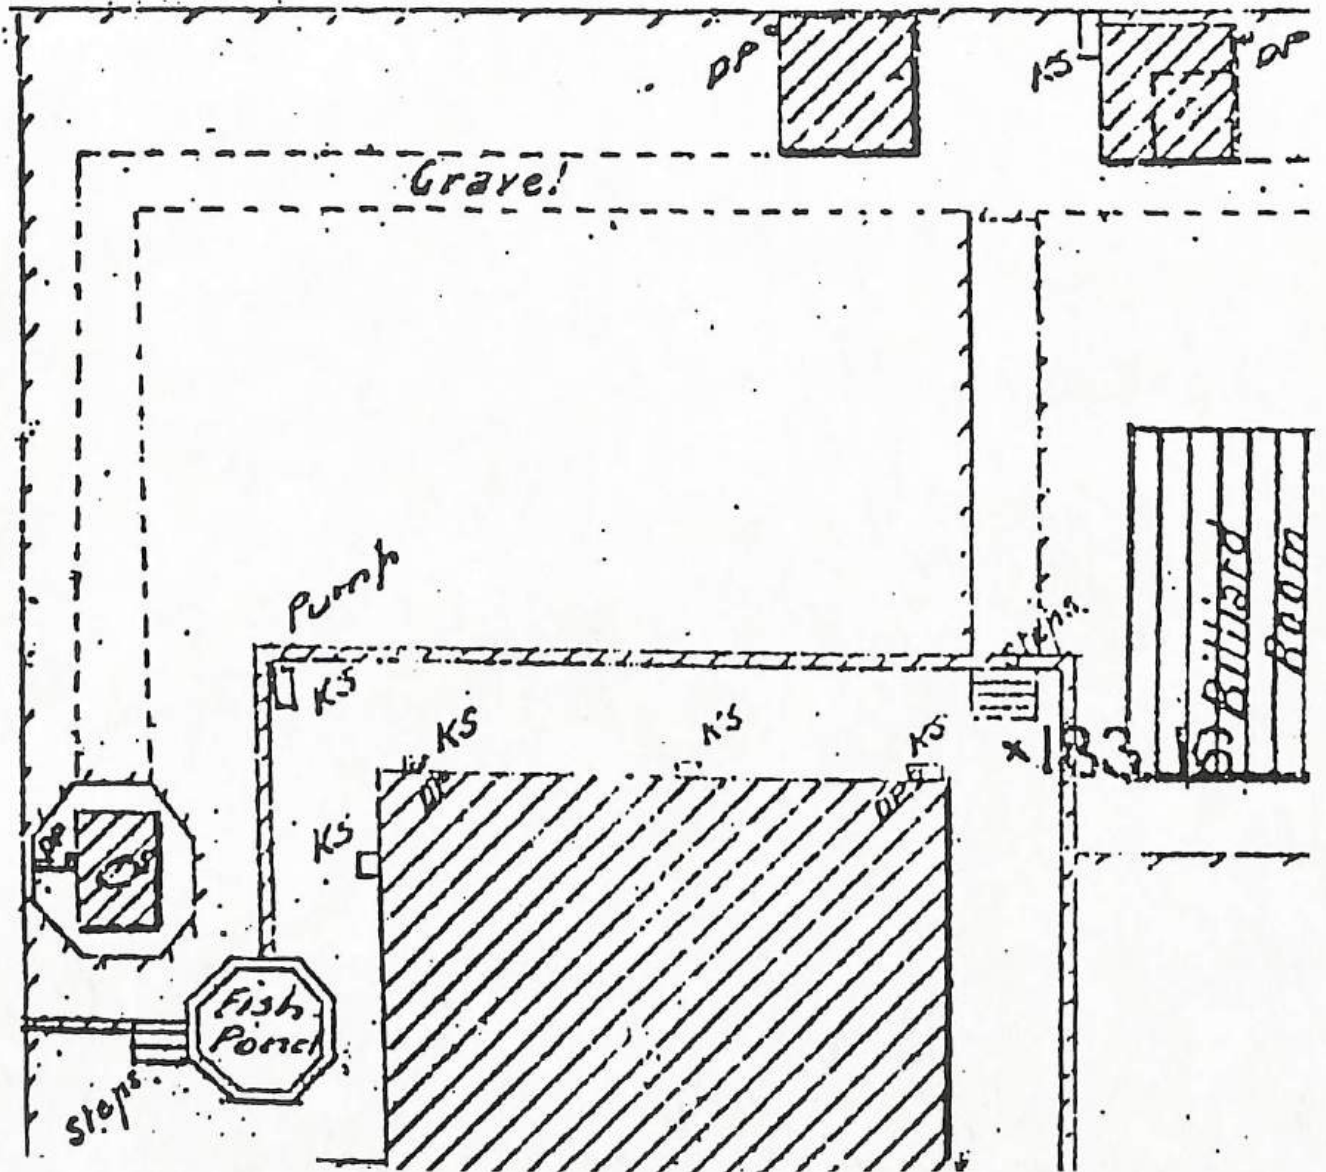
Garden North of the Retaining Wall, MMBW Detail Plan, Detail
